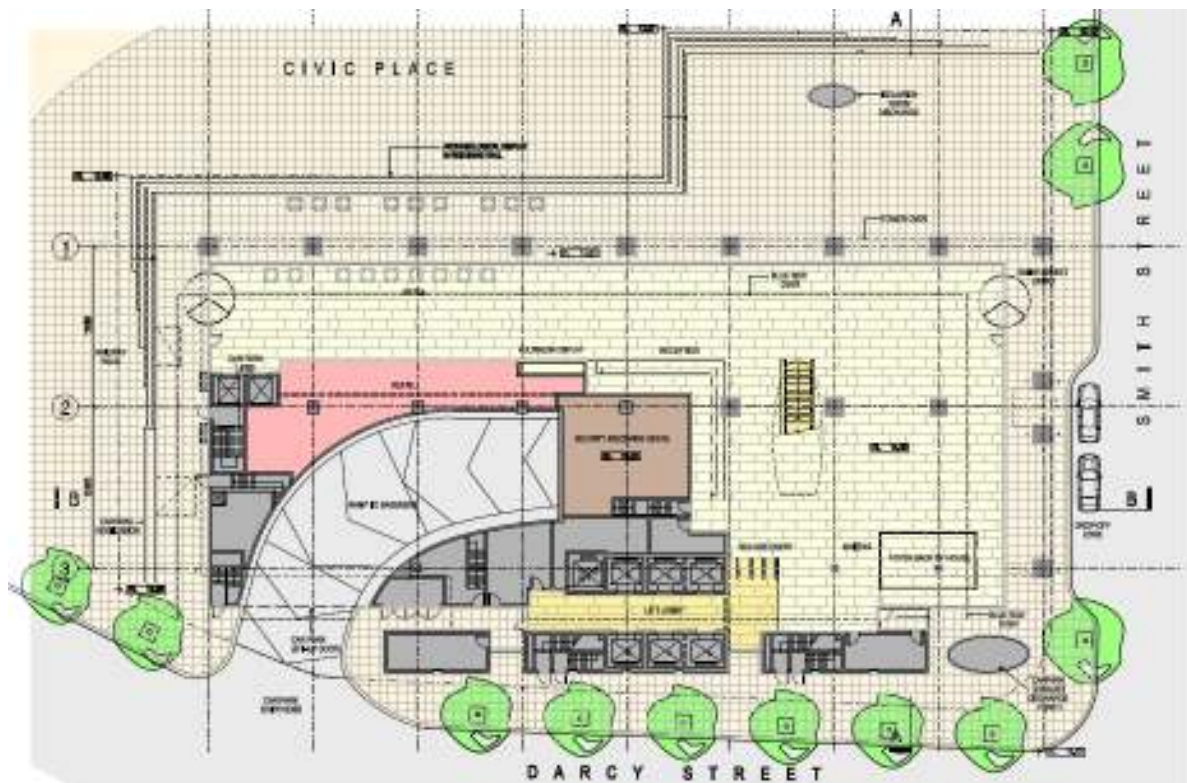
Ground Floor Plan (Note: Illustrated plan is to demonstrate access only, this plan is the originally submitted ground floor design and several design amendments have subsequently been made to this plan).
